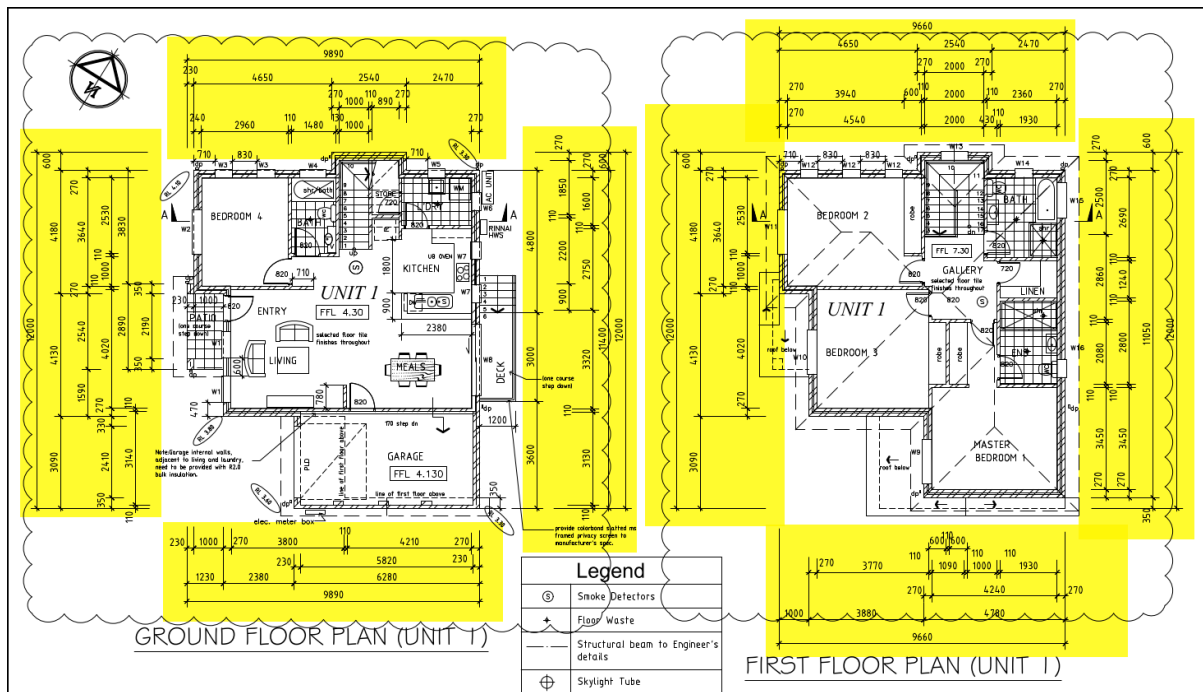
Proposed unit 1 floor plans (changes highlighted in yellow)
